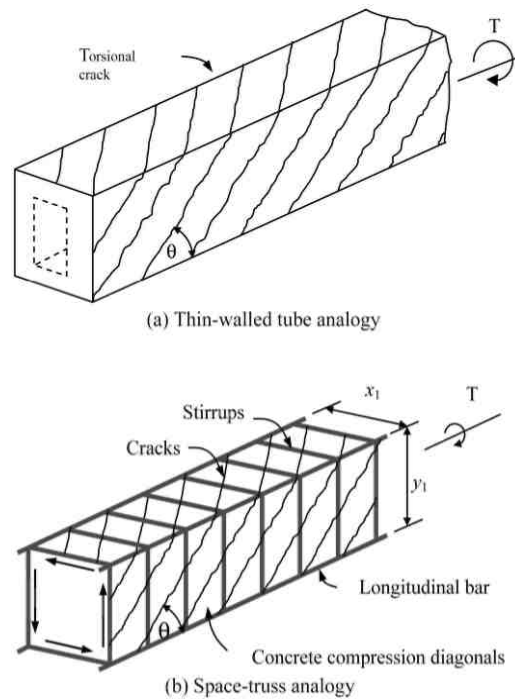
Thin-walled tube and space-truss analogy (Tang, 2006)
